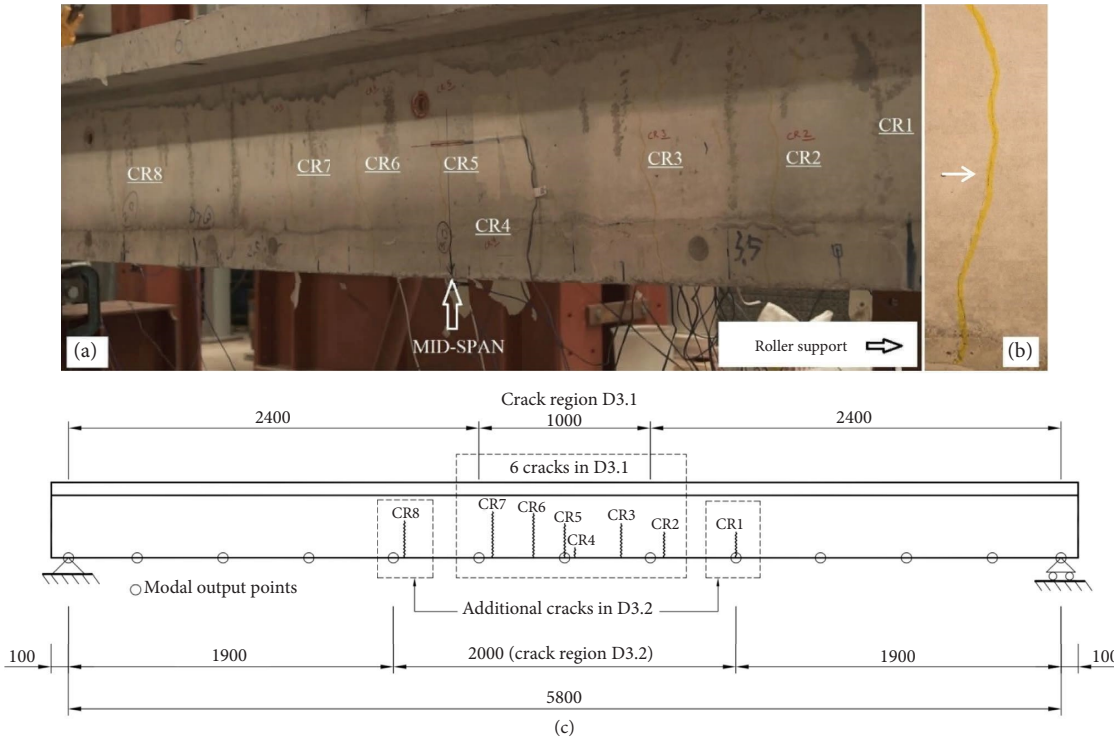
(a) Crack arrangements in D3.2. (b) A typical crack in D3.2 damage state. (c) Crack range schematic.
